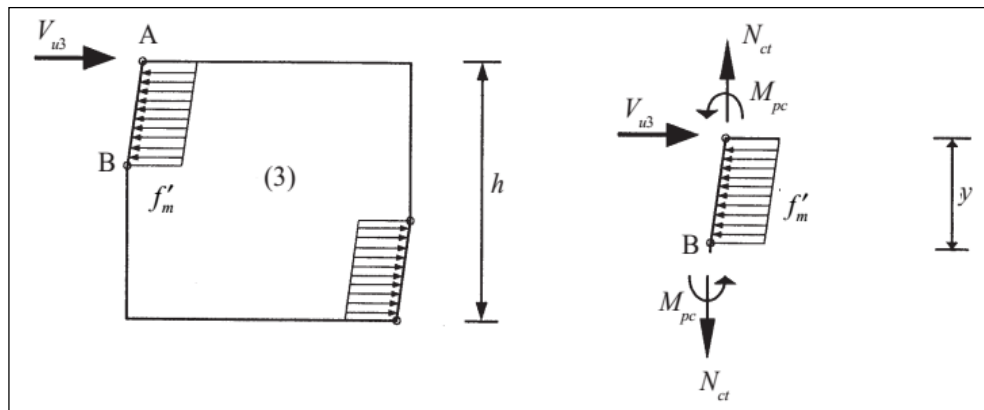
Failure mechanism 3 (Mehrabi & Shing, *Seismic Analysis of Masonry-Infilled Reinforced Concrete Frames*, 2003)
